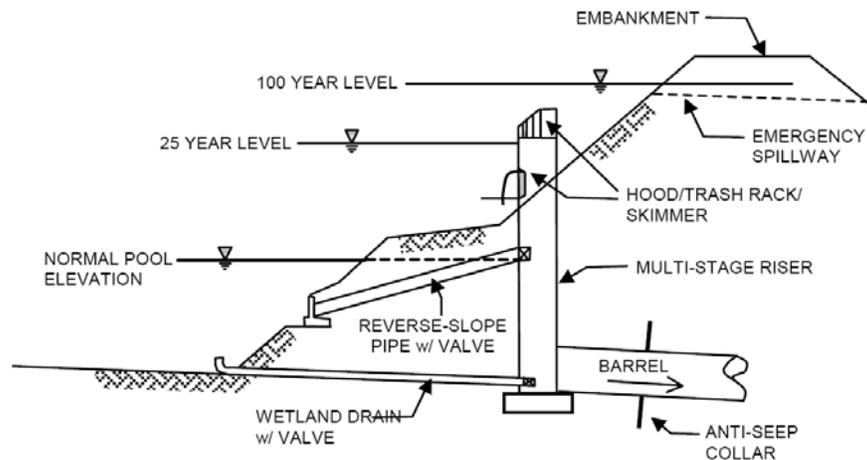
13 Typical Wetland Facility Outlet Structure
